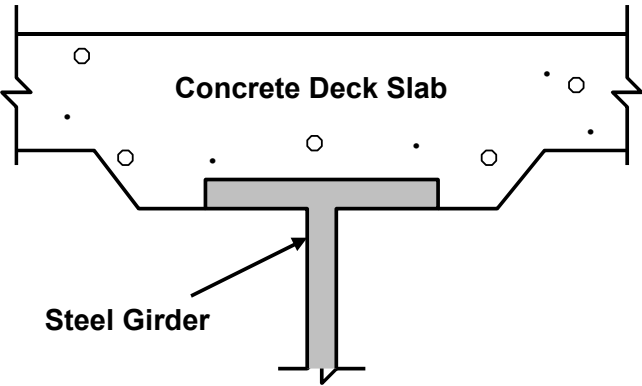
Embedment of Girder Flange in Concrete Deck Slab
